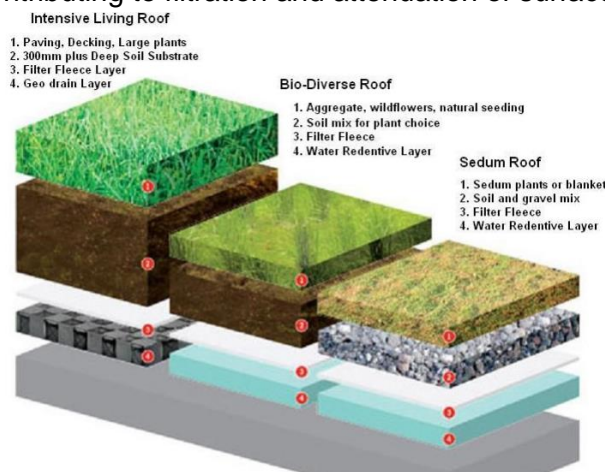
TYPICAL GREEN ROOF INTERCEPTION STORAGE DETAILS
